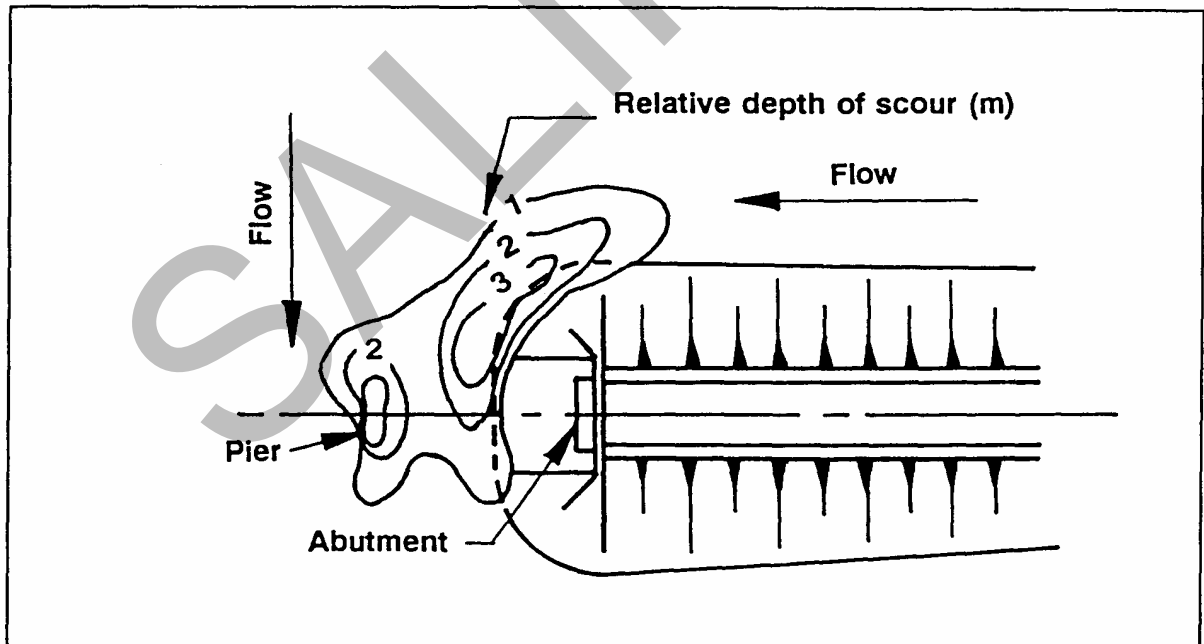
Scour at an Embankment and Adjacent Pier
